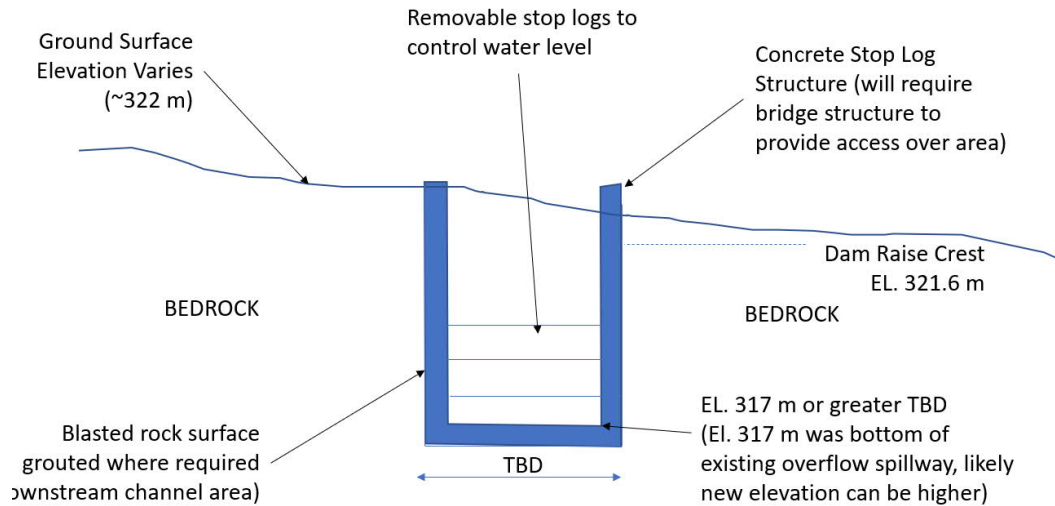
Section Through Proposed Overflow Spillway Structure Cut into Bedrock
